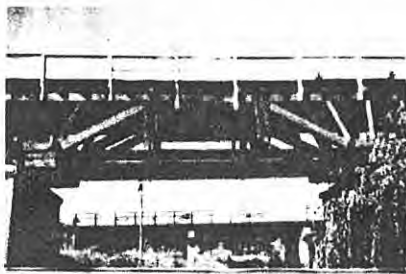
John Whitton used British technology at every opportunity, even when compelled to use timber trusses. Six sets of these Queen Post trusses, modelled on Brunel's bridges in Devon and Cornwall, were built in New South Wales during 1885-89. All are still in service.
